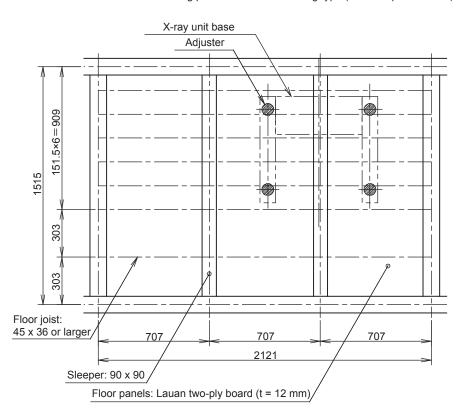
Example of conventional wooden construction with floor joist reinforcing (base-mounted)
